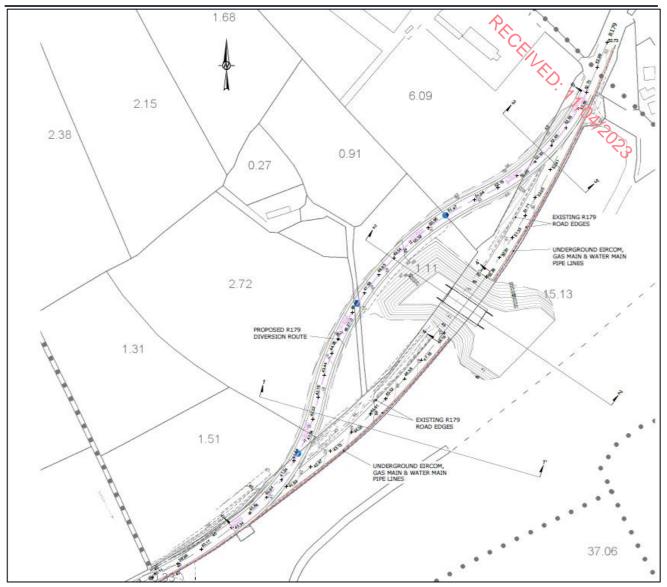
Routes for the proposed Temporary Diversion Road and Cut-and-Cover Tunnel
